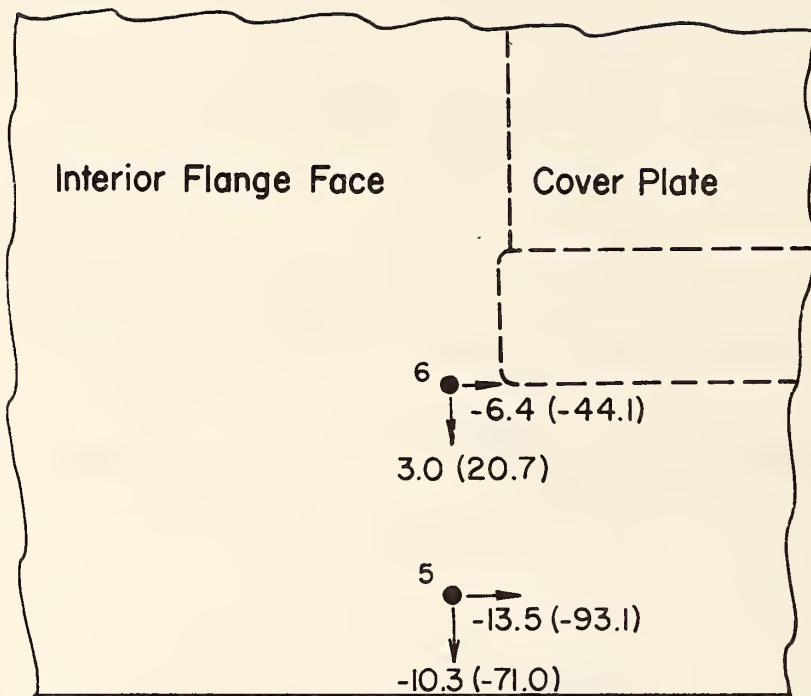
End-Welded Cover Plate Surface Residual Stress
